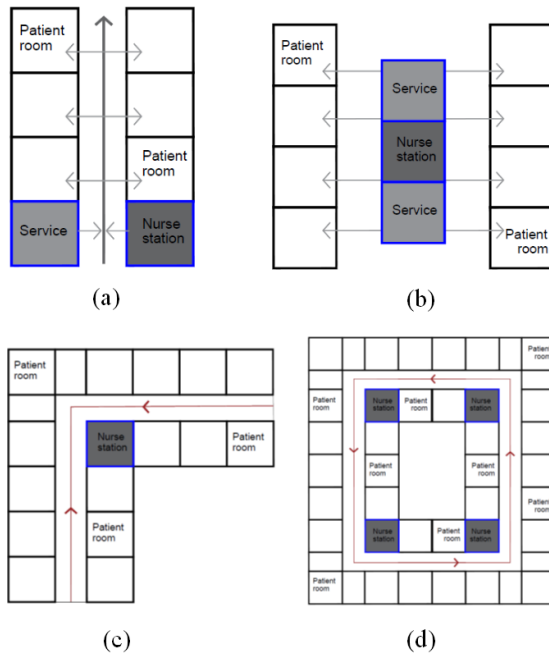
Linear flow configuration showing (a) single corridor layout, (b) double corridor layout, (c) L-shaped, and (d) looped corridor layouts
